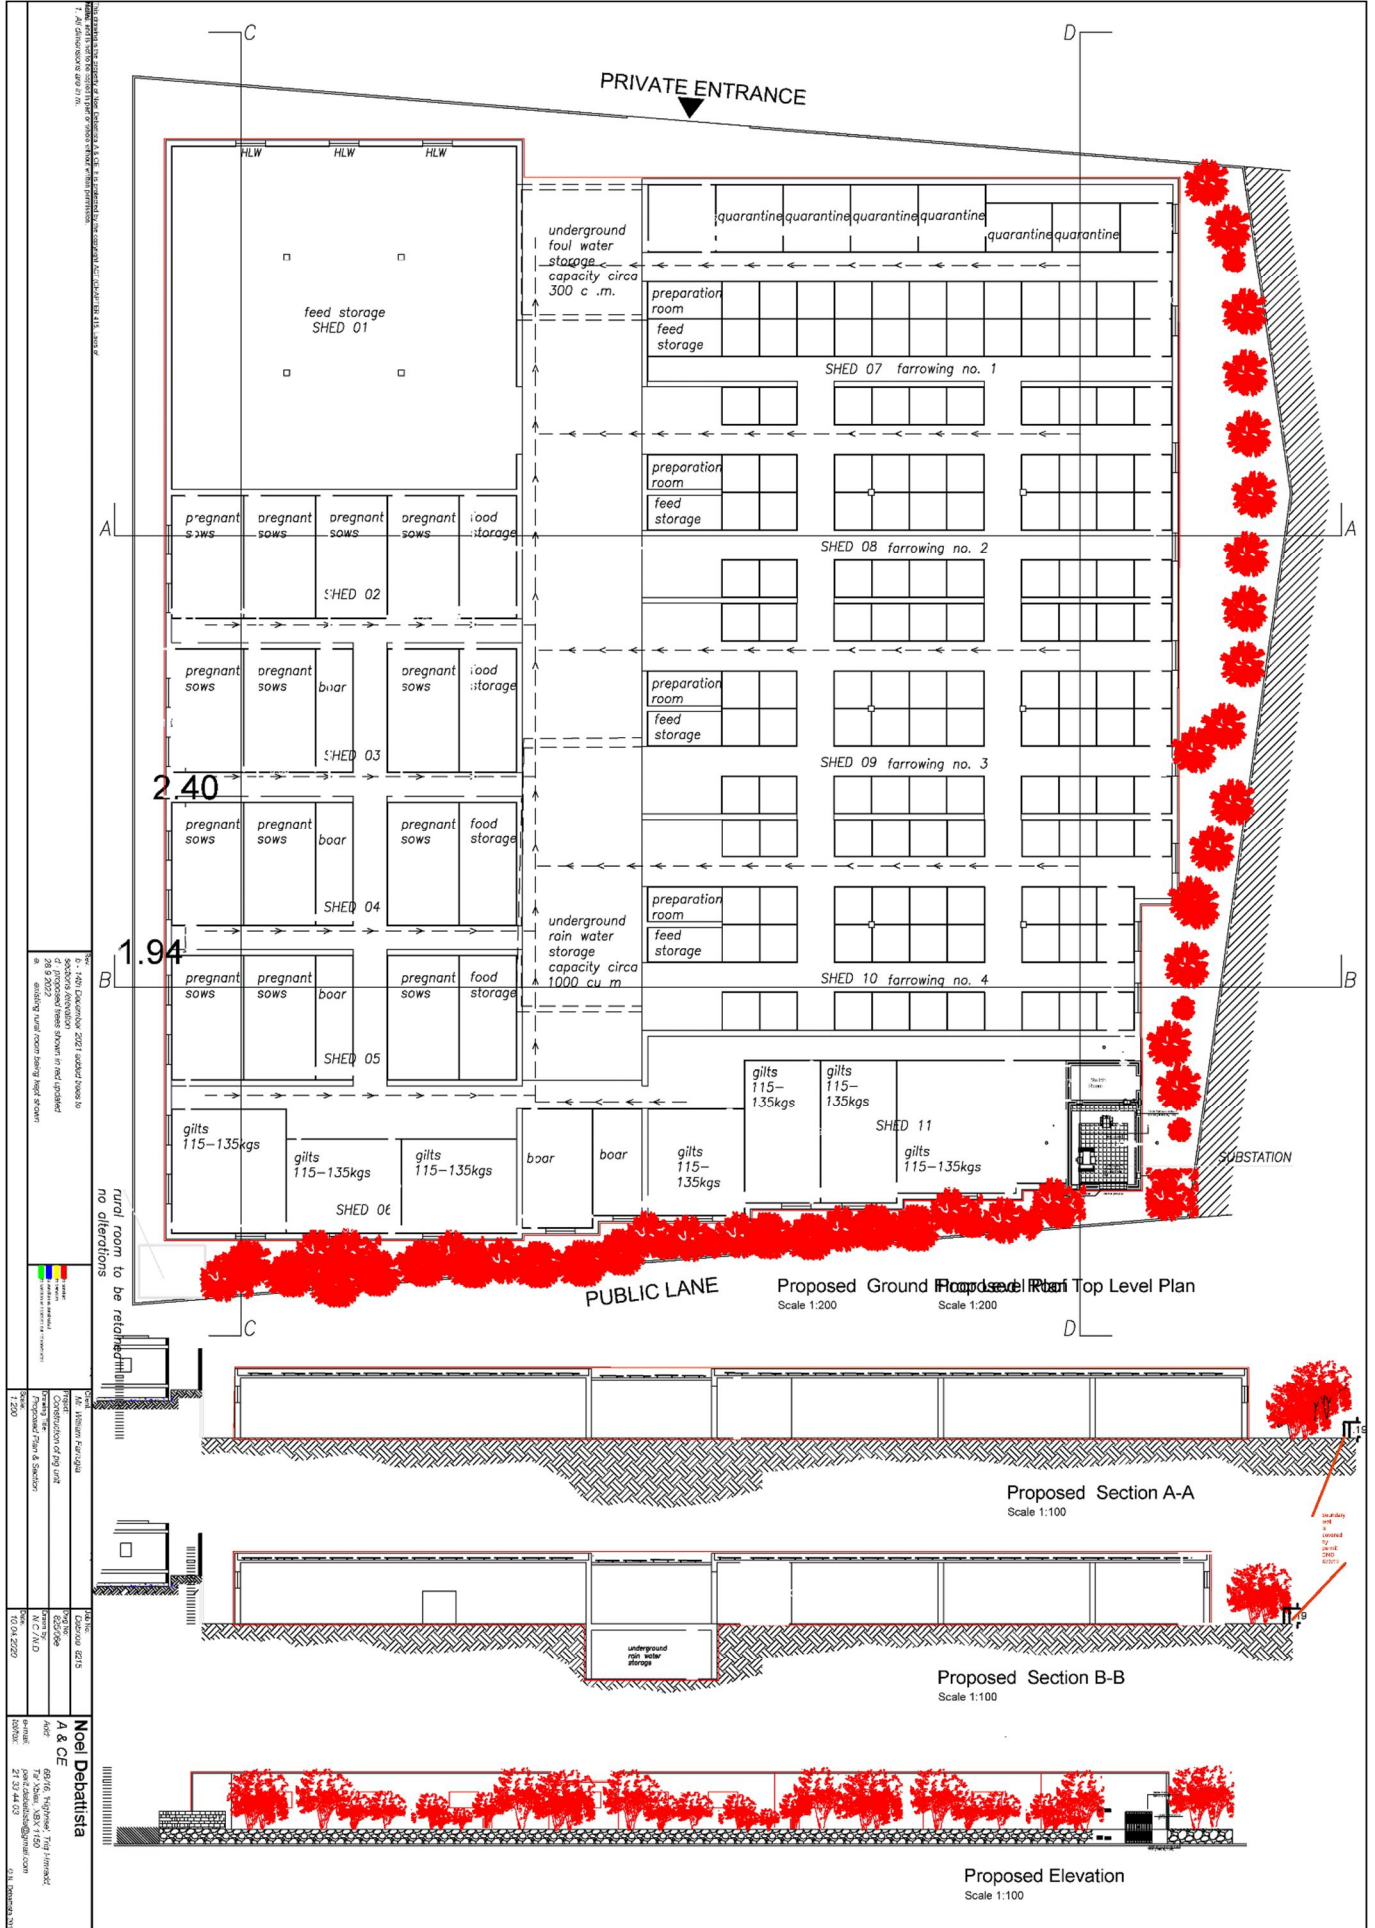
Project Drawings | roof layout of and sections thru the production and feed storage building (Debattista, 2020-2022)
